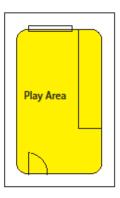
Vidant NICU Play Room Plan. Not to scale.
